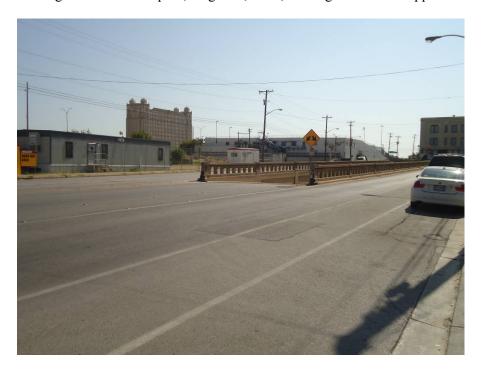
400 W. Vickery Boulevard, June 9, 2016, looking northwest
